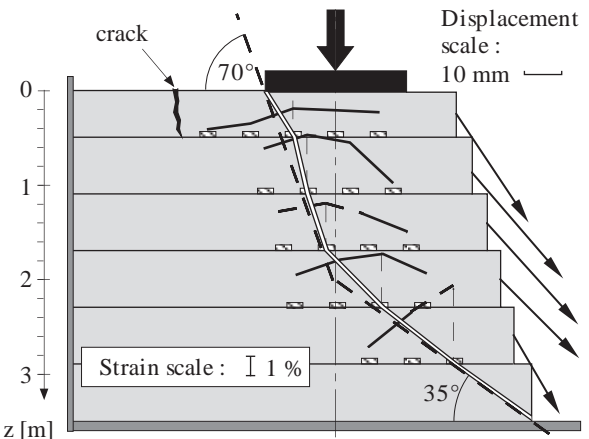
Deformations and failure mechanisms of a slope reinforced by layers of geotextiles
